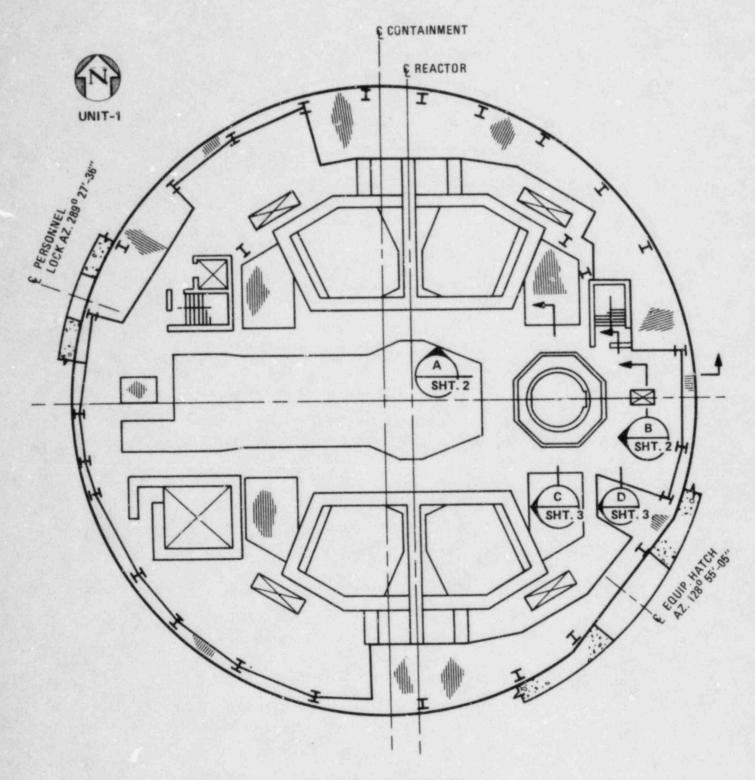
STRUCTURAL STEEL DESIGN DETAILS (Sheet 9 of 9)
